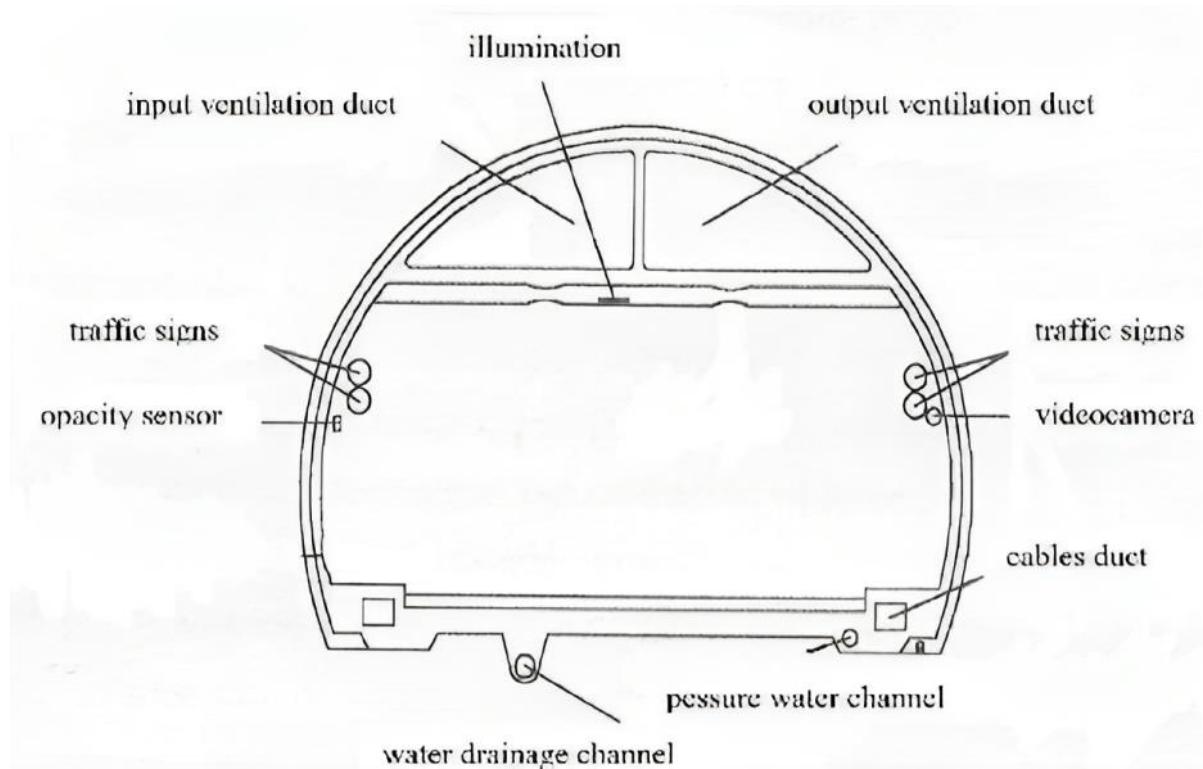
Example of cross-section of an equipped road tunnel. [4]
